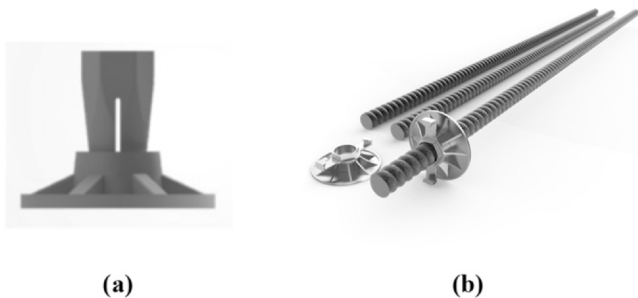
(a) Spin bolt, nut and plate; and (b) FRP rockbolt with a plate [46].
